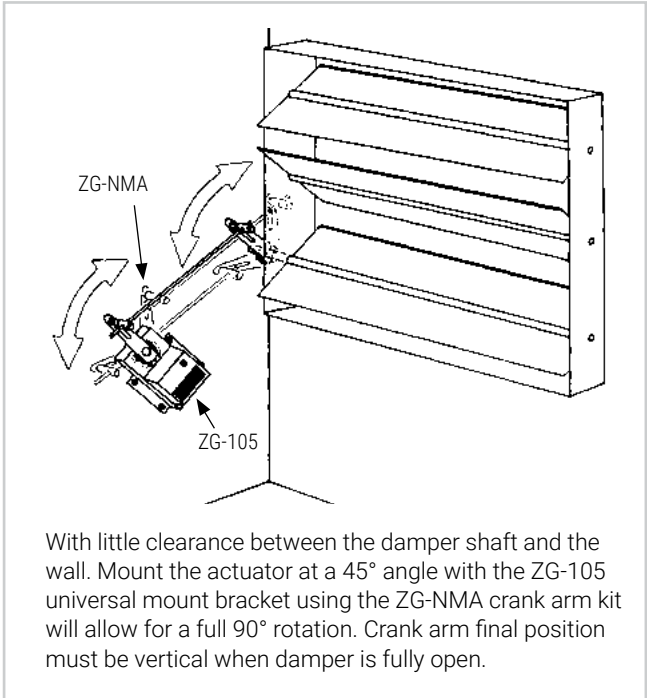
ZG-105 universal mounting bracket and ZG-NMA crank arm kit
